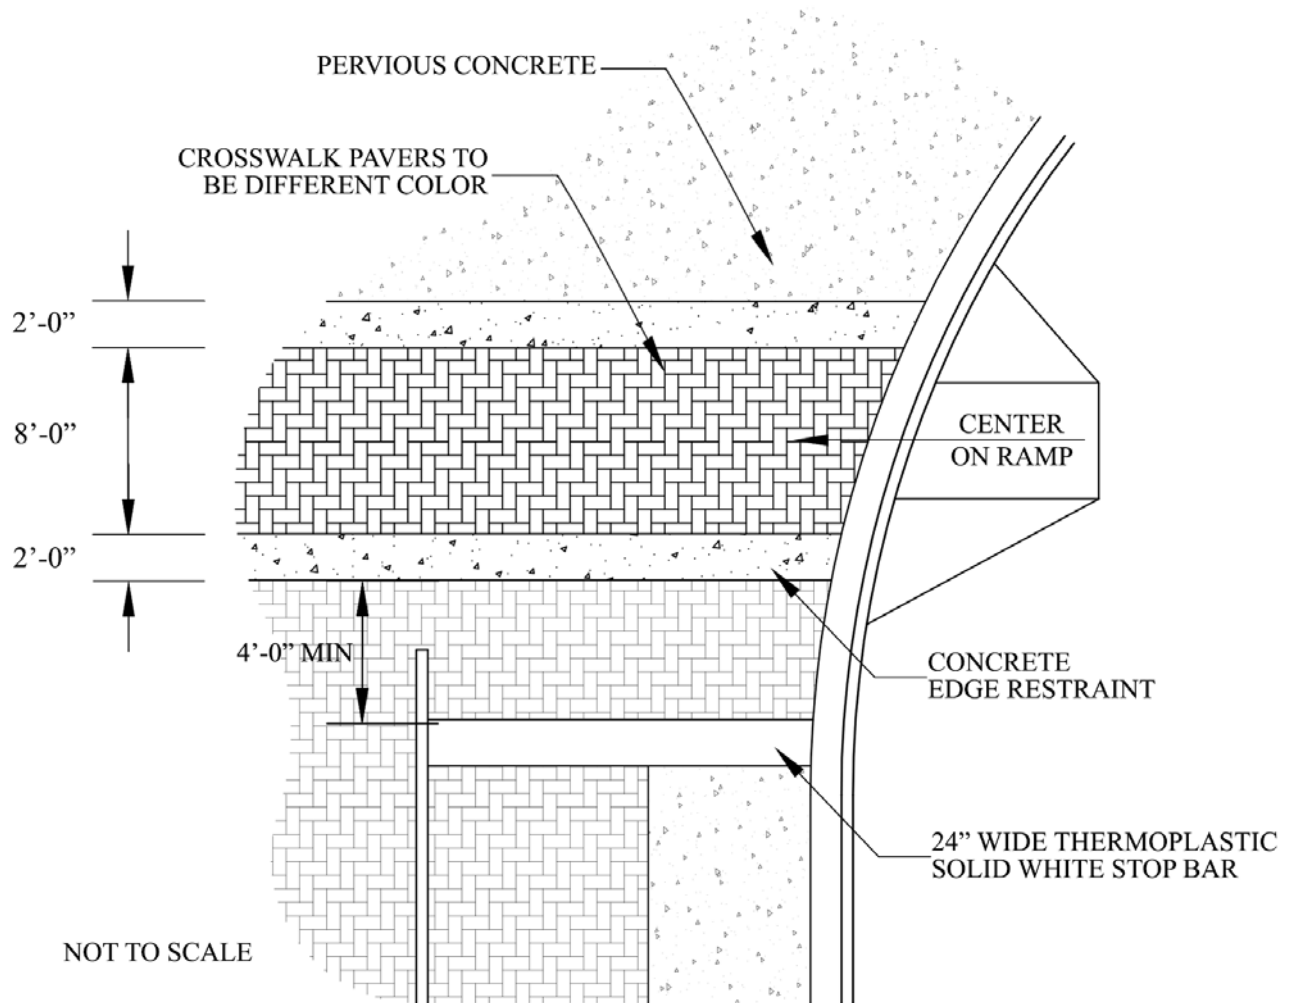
Typical Crosswalk Detail, *image by Author.
